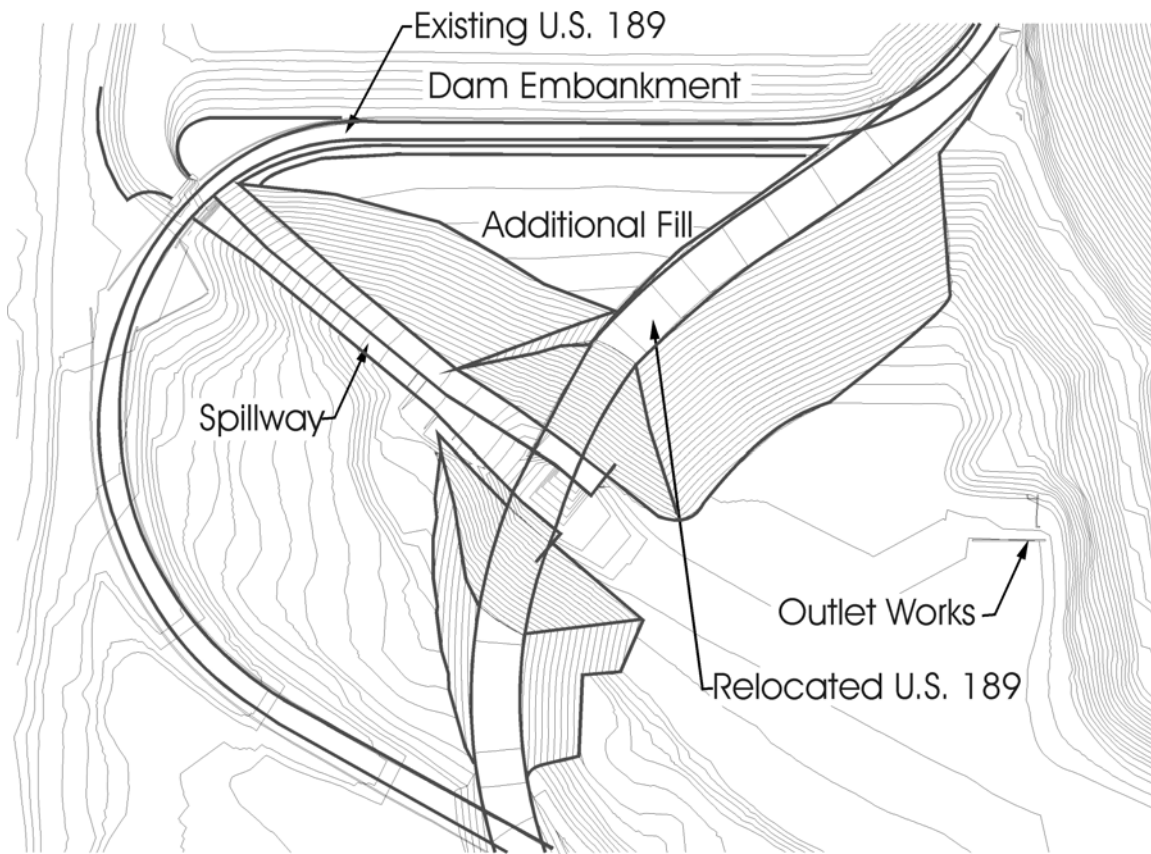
Plan view of Deer Creek Dam with proposed Highway 189 alignment
